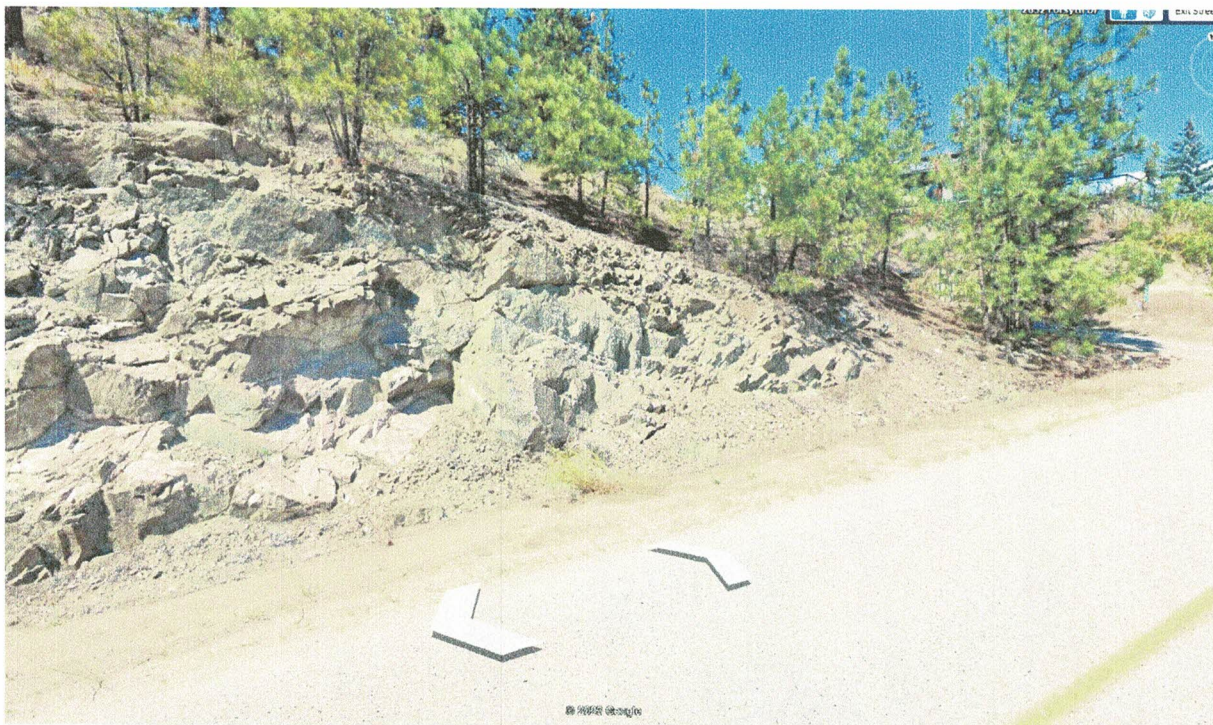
(Google Earth): Street view looking northeast up Forsyth Drive
